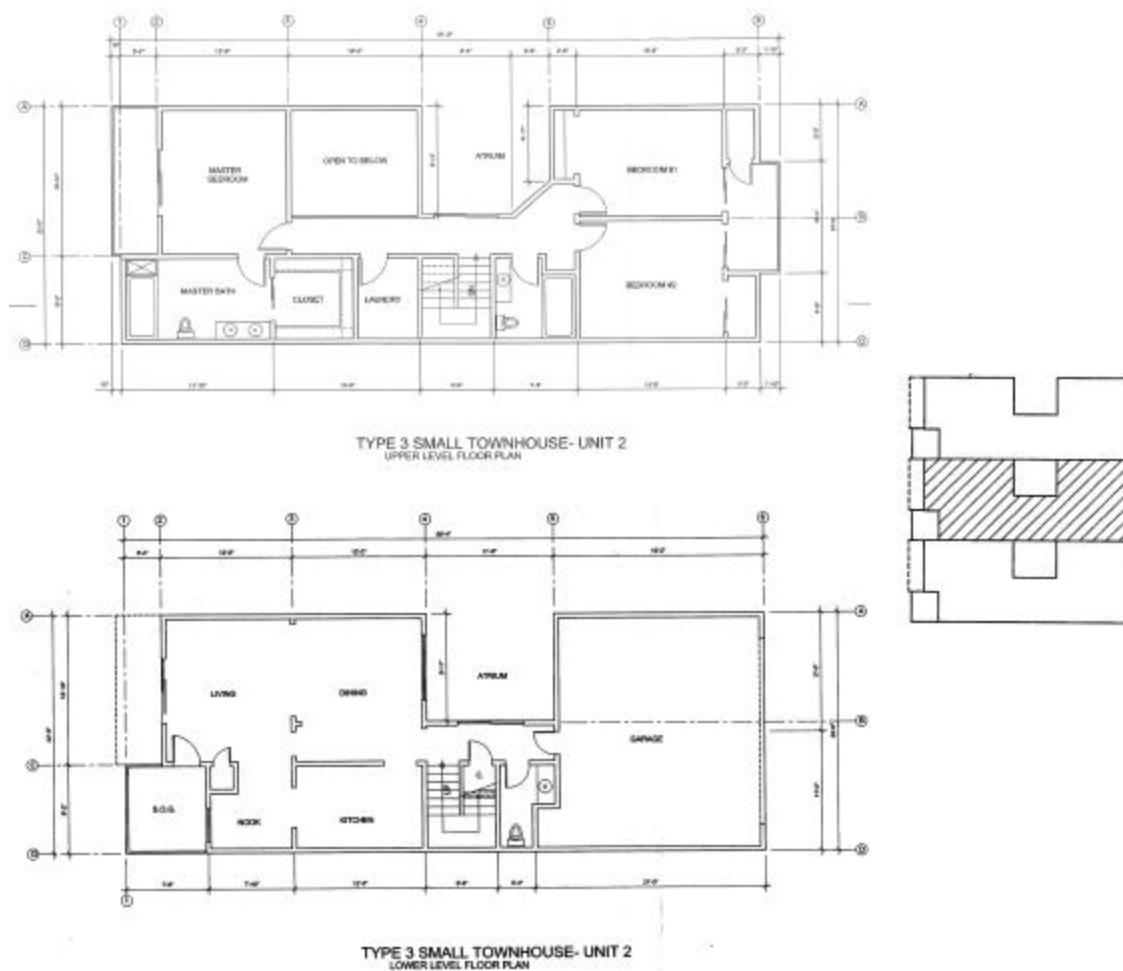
Plan Views of the Townhouse Index Building (Cobeen 2001).
